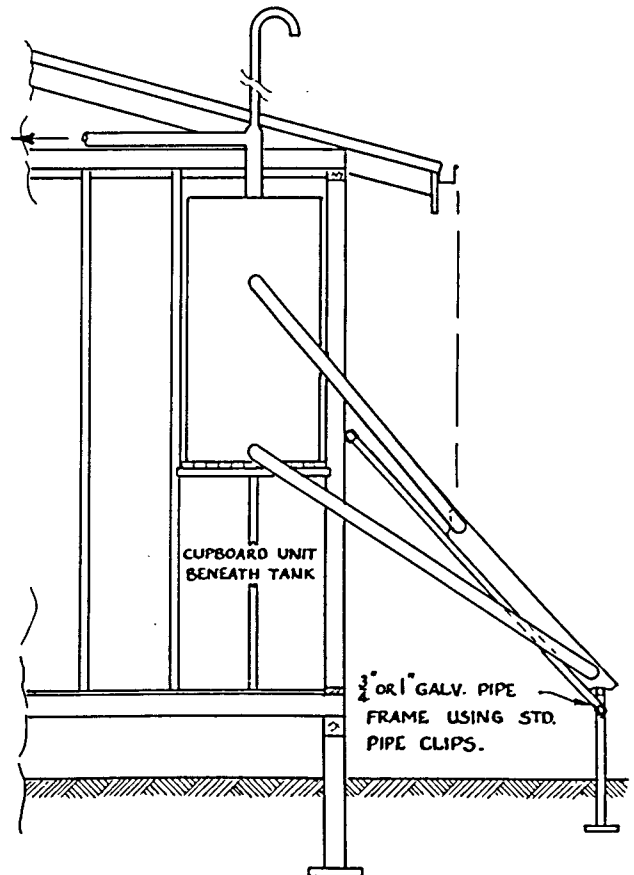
Installation showing storage tank supported on partition wall between two rooms
